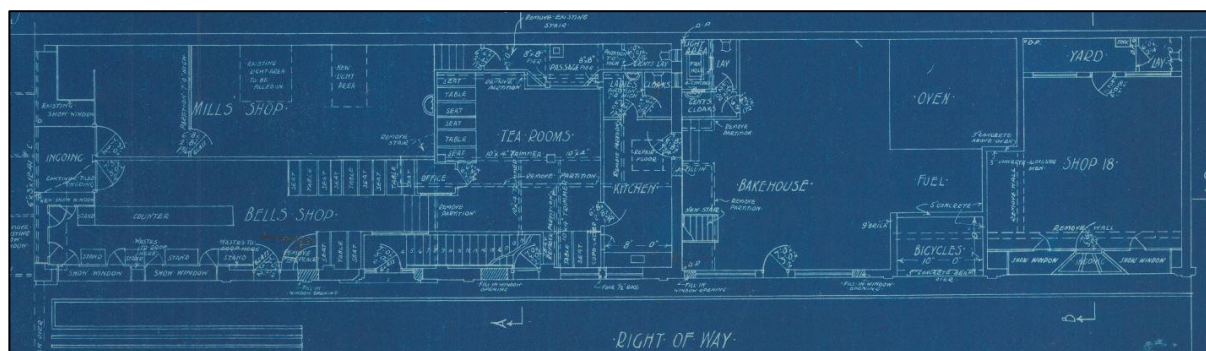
Detail from 1933 plan showing original ground floor layout of Tay Street end of arcade (Tay Street to left) (Ford, 1933).
